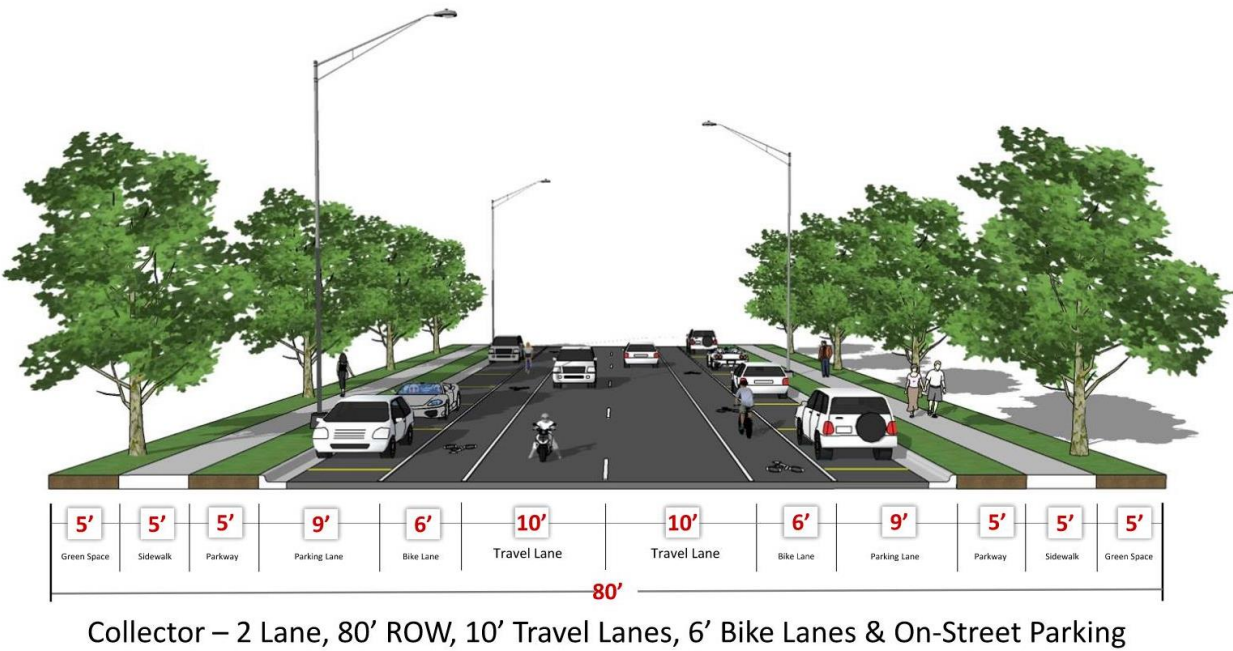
Recommended Section – Collector, 2-Lane Undivided
